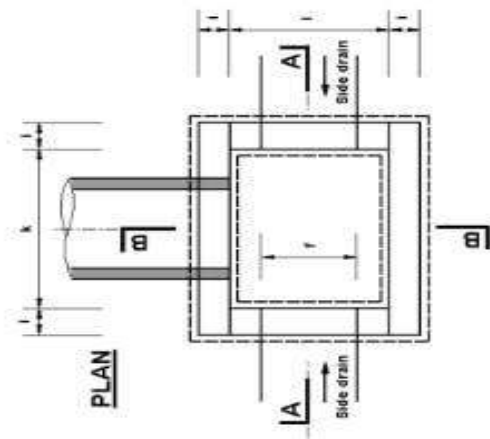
HEADWALL TYPE 3A (CONCRETE BLOCK HEADWALLS)
